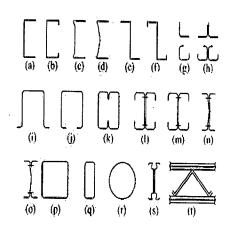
Cold-Formed Steel Sections used for Structural Framing. (From Yu, W.W. 1991. Cold Formed Steel Design, John Wiley & Sons, New York.)
